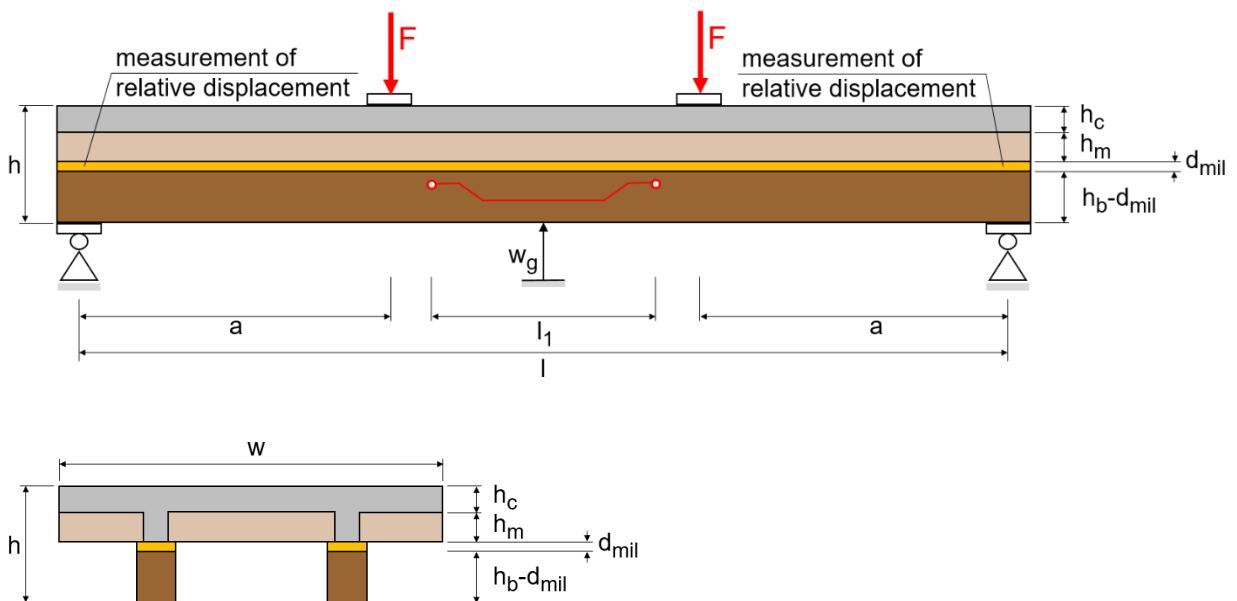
Test arrangement for full-scale tests and cross-section for beam base material with moulding
